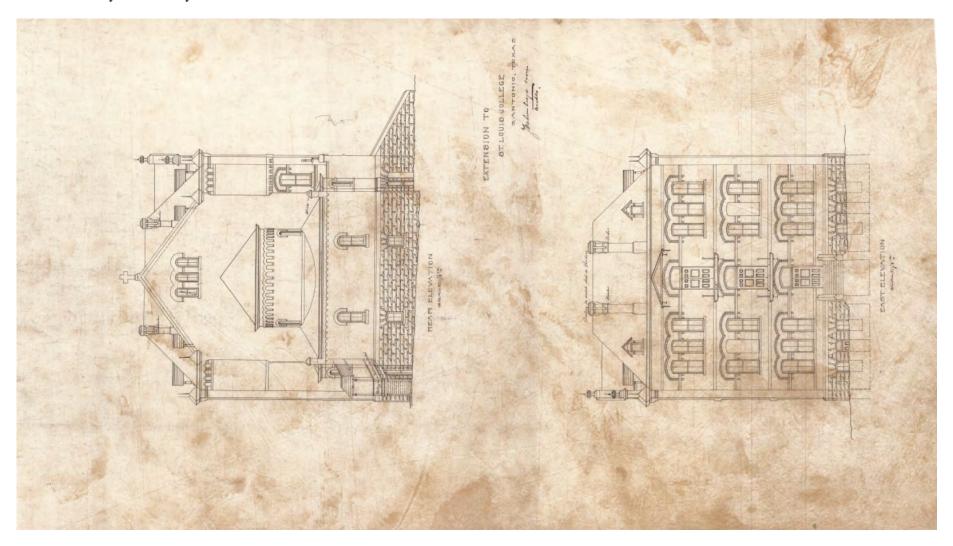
James Wahrenberger, Reinbolt Hall Construction Drawings, North Elevation, 1908
